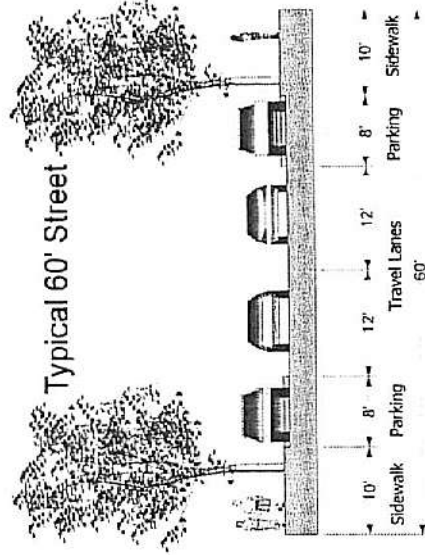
R: Typical 60-Foot Street cross-section, with two travel lanes, parallel parking and 10 foot sidewalks. Parking reduction is in favor of sidewalk widening and streetscape amenities.
